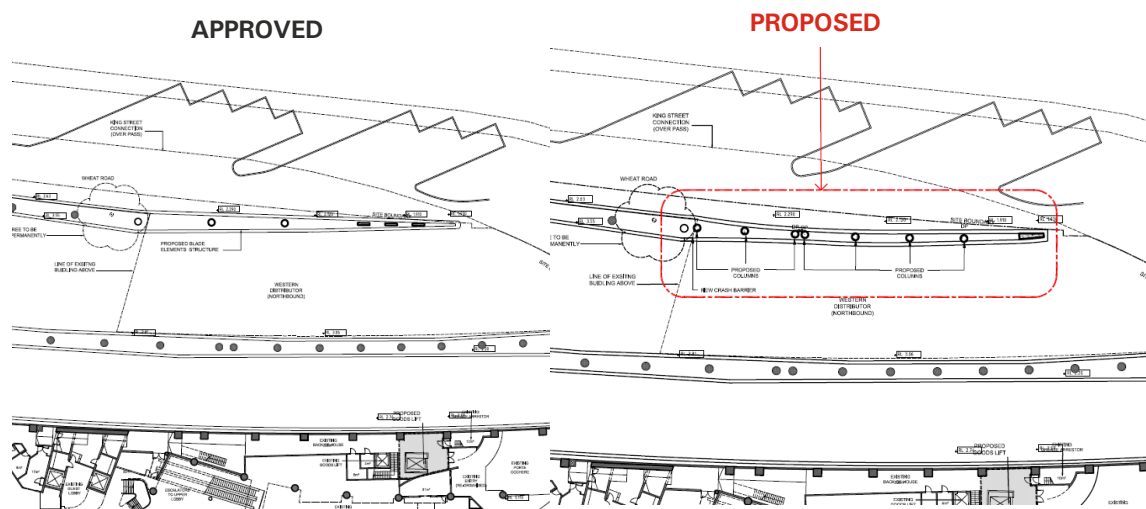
Approved vs proposed location of structural columns and footings under convention space
